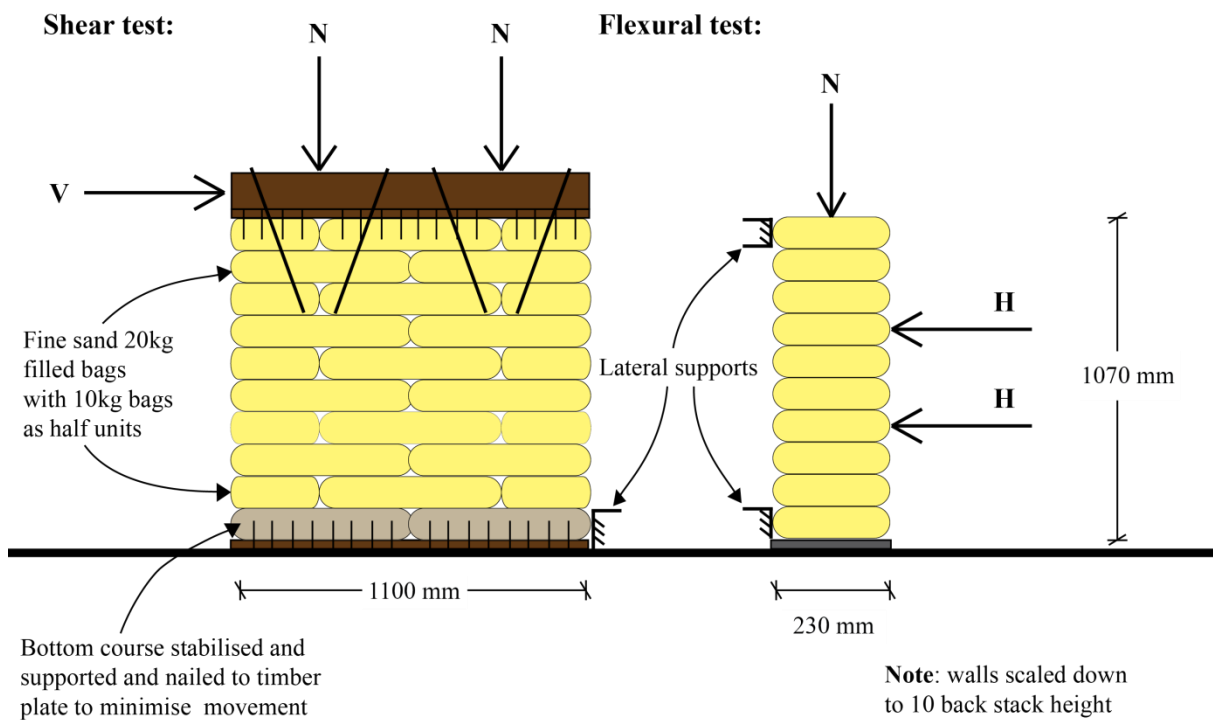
Model walls to be tested in shear (left) and flexure (right) without render or barbwire
